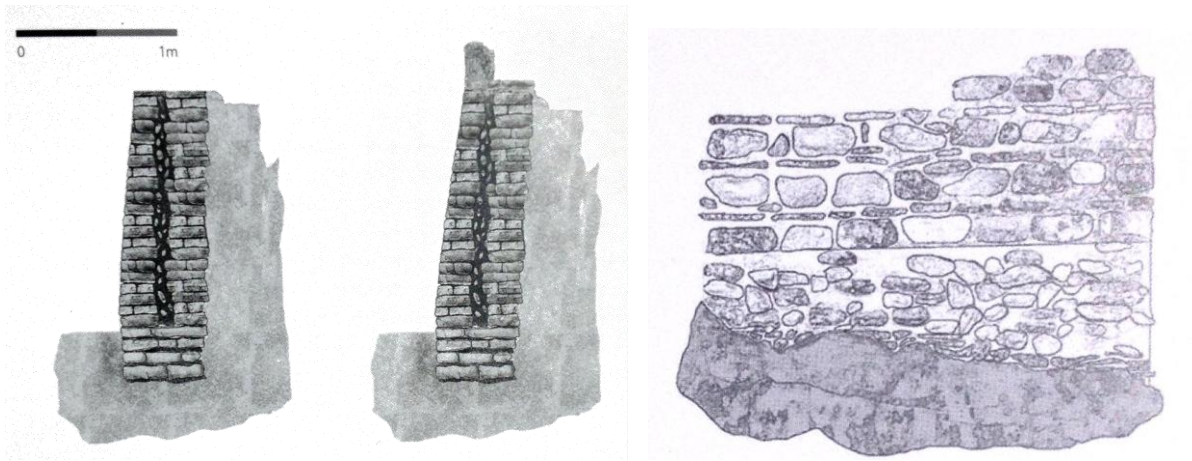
43- Section scheme of retaining wall in Estremoz, Figure 3. 44- Elevation scheme of the base assembly of the fortress tower in Evaromonte.
